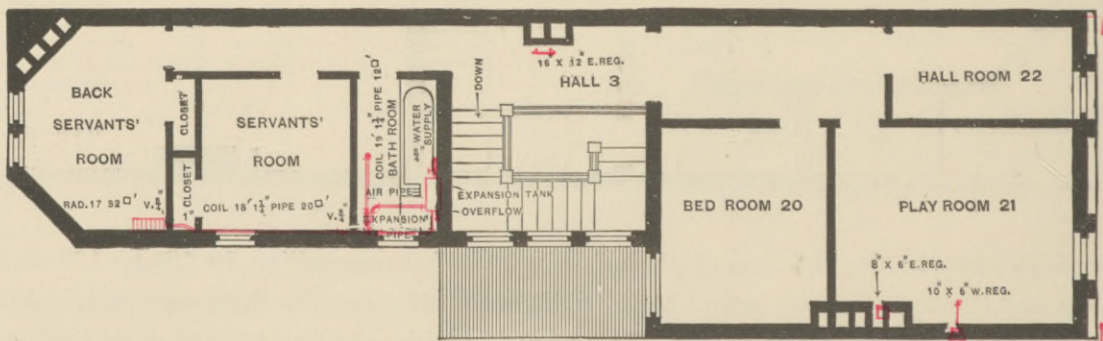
Plan of Fourth Floor. Scale  $\frac{1}{12}$  inch to the foot.
